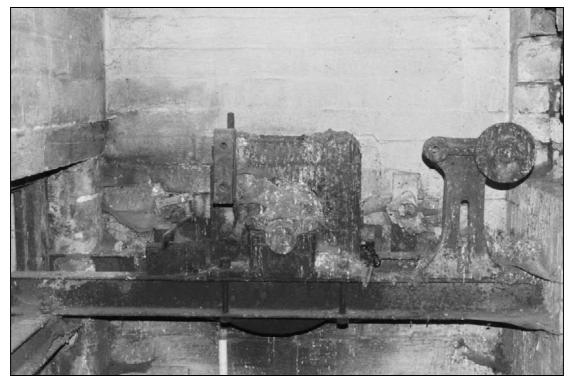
Detail of inserted lift mechanism, room G22 (film 26.20)
